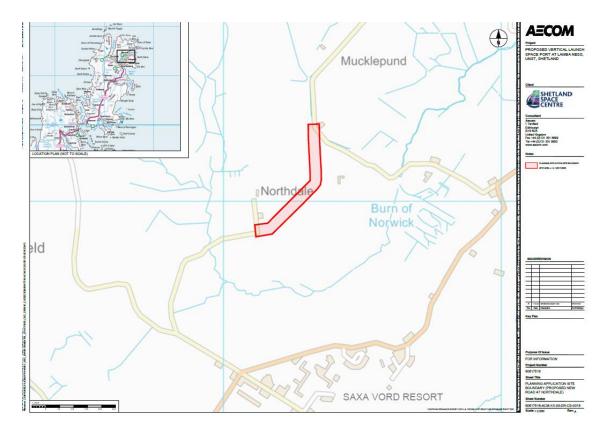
Proposed New Section of Access Road Boundary (red line) and the Burn of Norwick.
